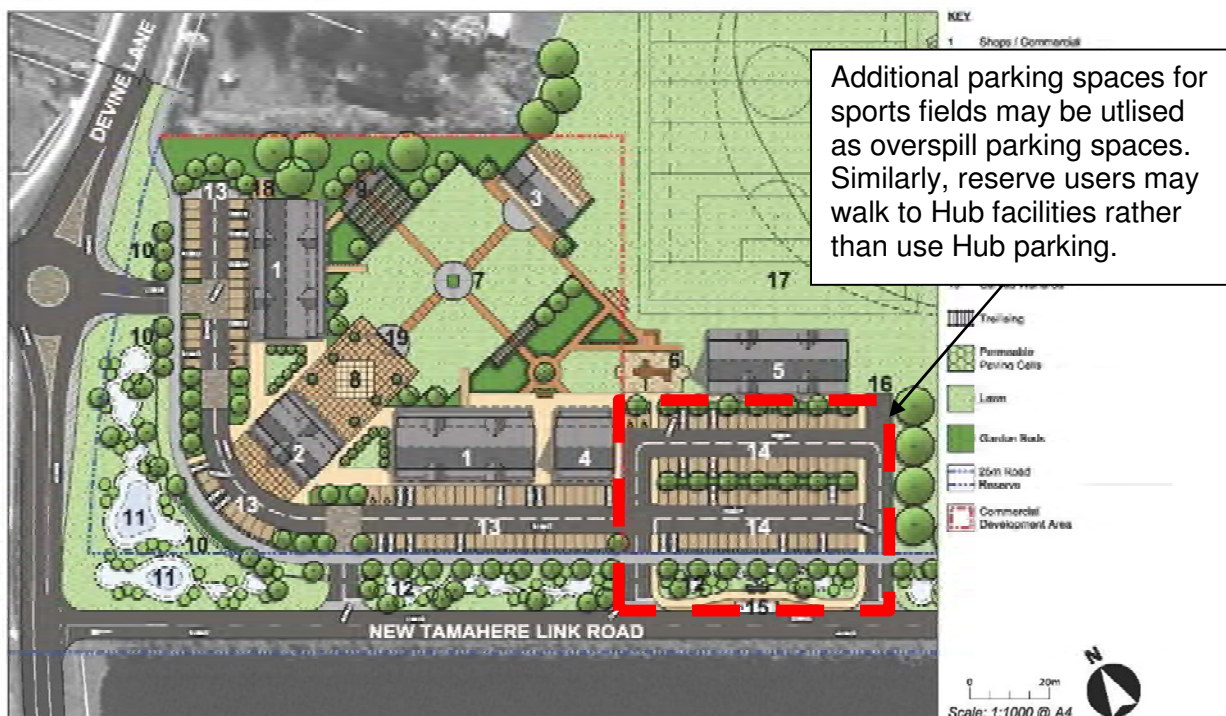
Waikato District Plan – 23B.4 Tamahere Village Concept Plan
